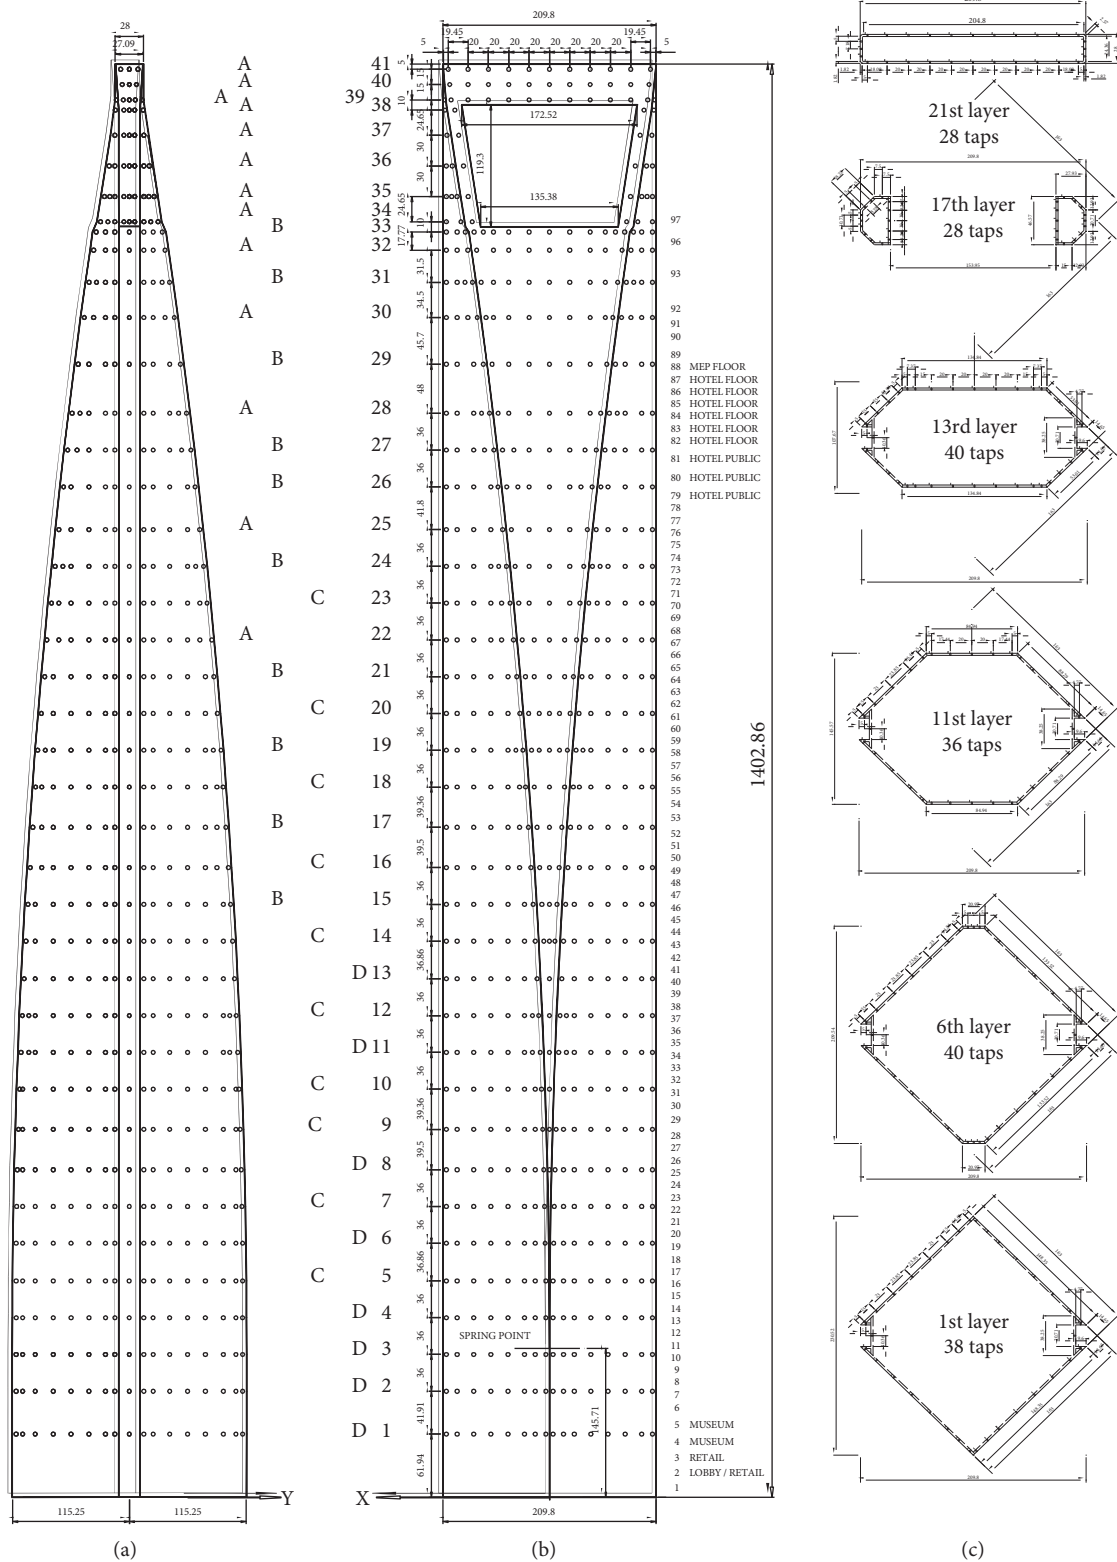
Layout of measuring points for pressure measurement model of Shanghai World Financial Center. (a) Side elevation. (b) Front elevation. (c) Cross section on typical height.
